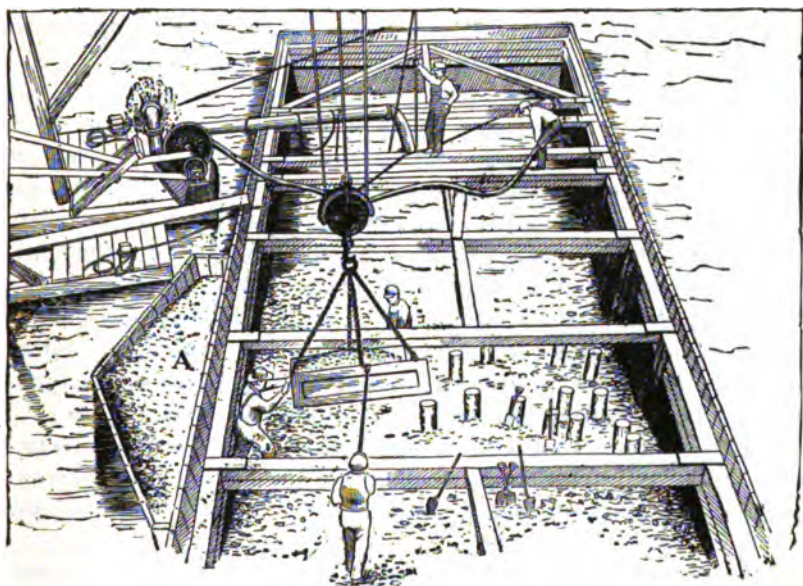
TOPEKA BRIDGE, COFFER-DAM NO. 4.
